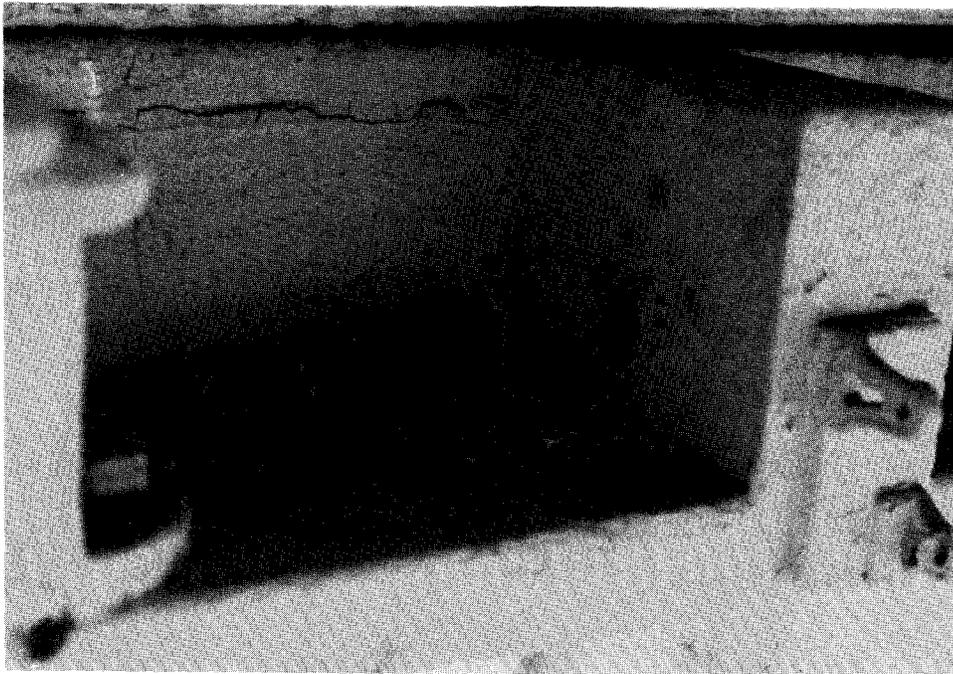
Tower, displaced pin at top of Lantern Deck window wall.
